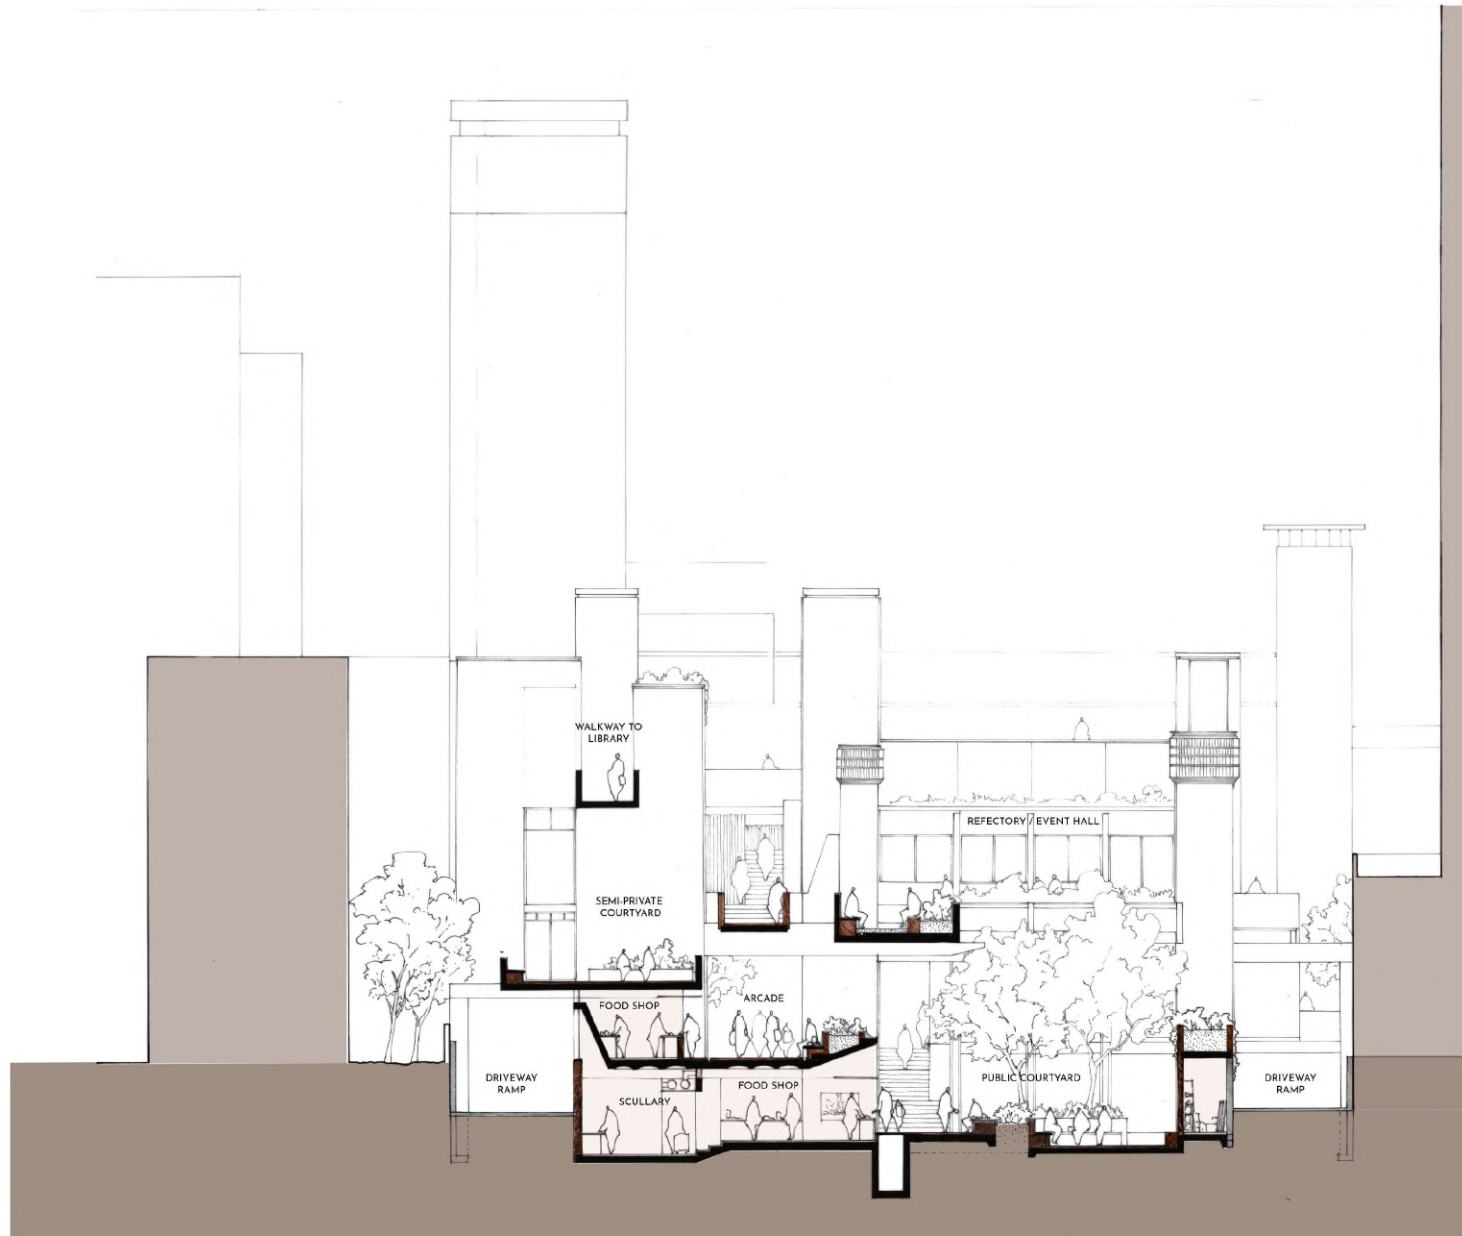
1:100 Cross section through courtyards (Author 2021)
